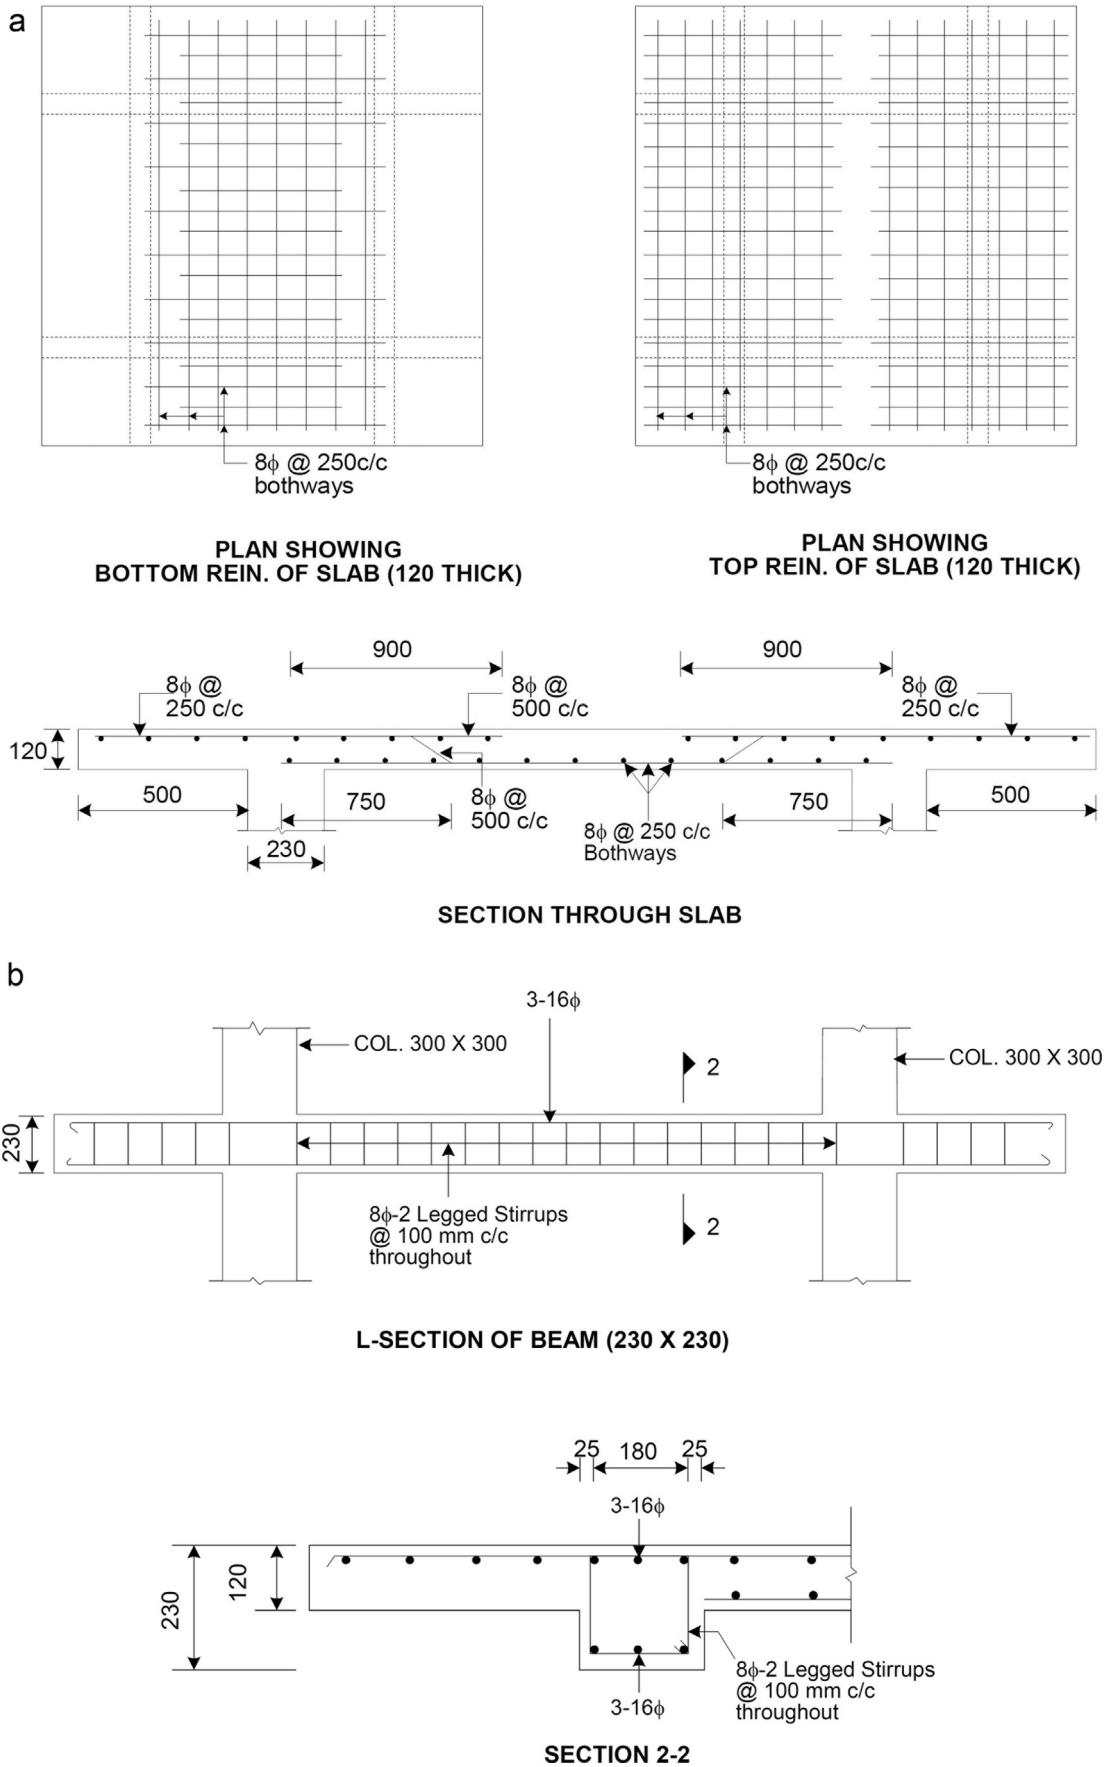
Detailing of reinforcement in a typical (a) slab and (b) beam.
